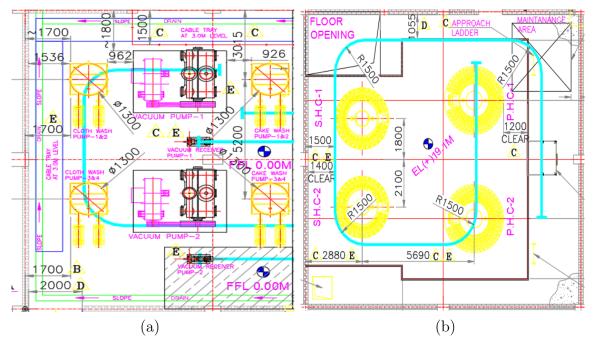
Plan Layout (a) Vacuum Pump Area; (b) EL (+) 17.6m
